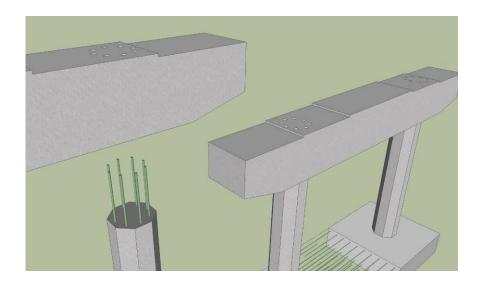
Plastic Moment Connection Test Precast Concrete Column-to-Cap [51] (source: Splice Sleeve North America Inc.)
